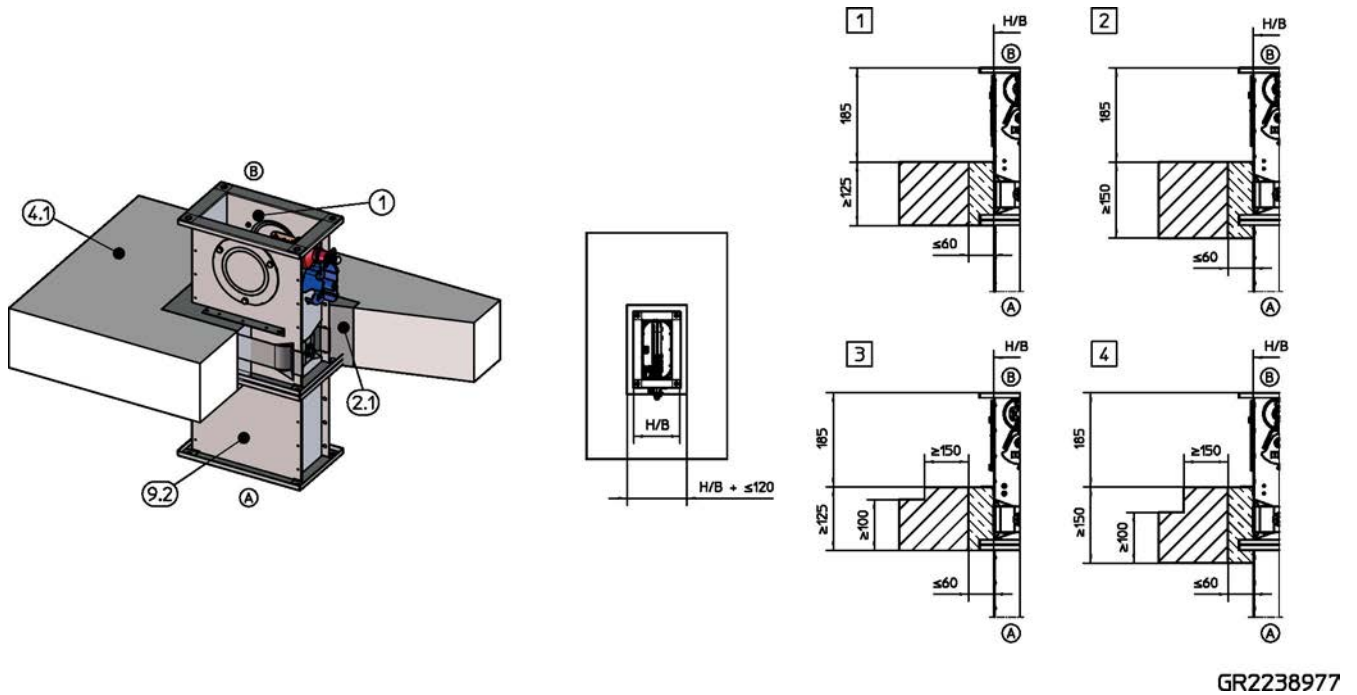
Mortar-based installation into solid ceiling slab, upright
